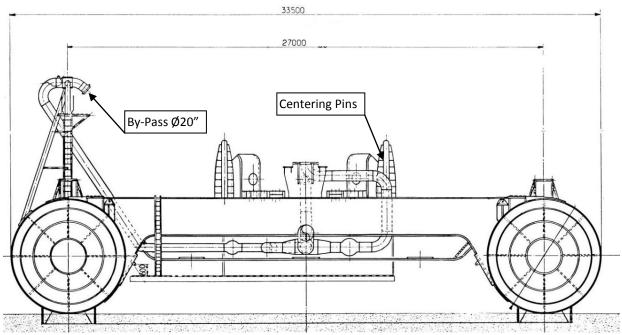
Section view from drawing C001-L-A40-NA-001, section B
